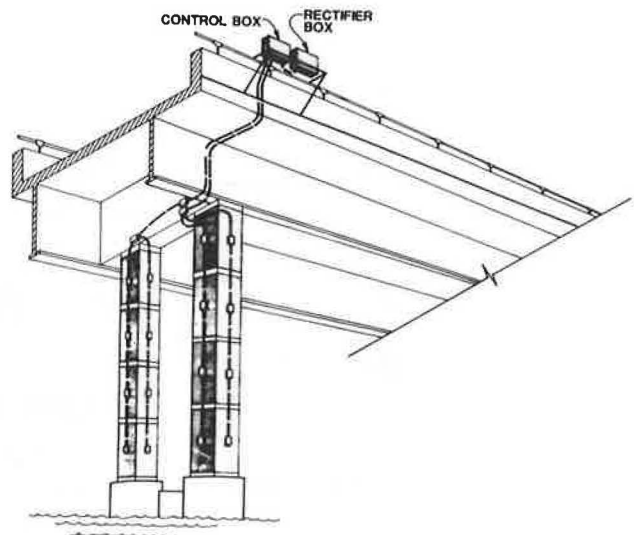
Pier 4, Richmond-San Rafael Bridge.
